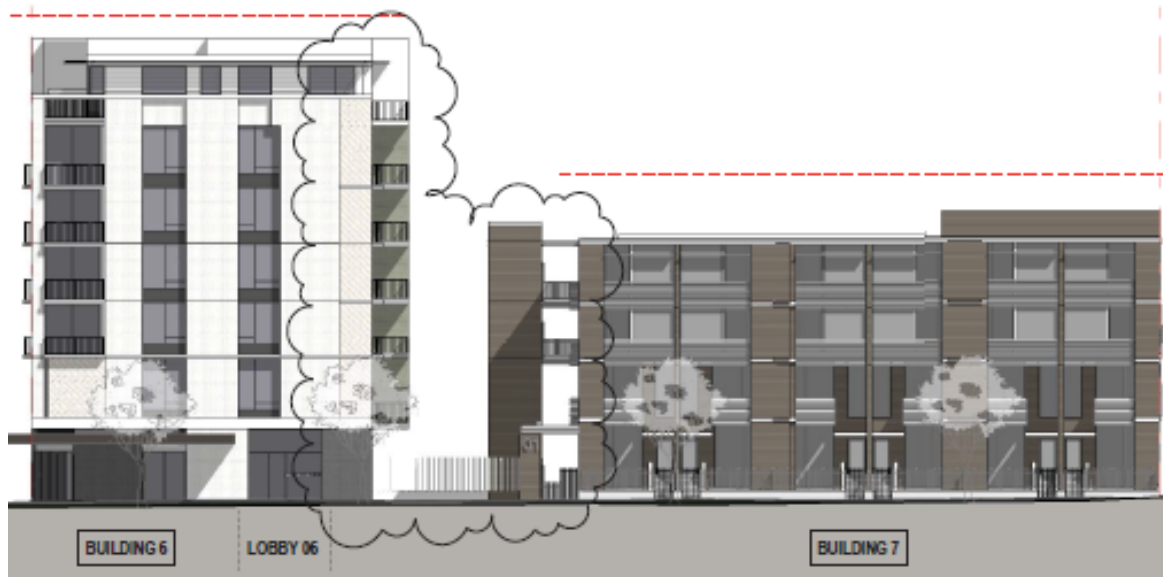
Tung Hop Street elevation of Buildings 6 and 7
